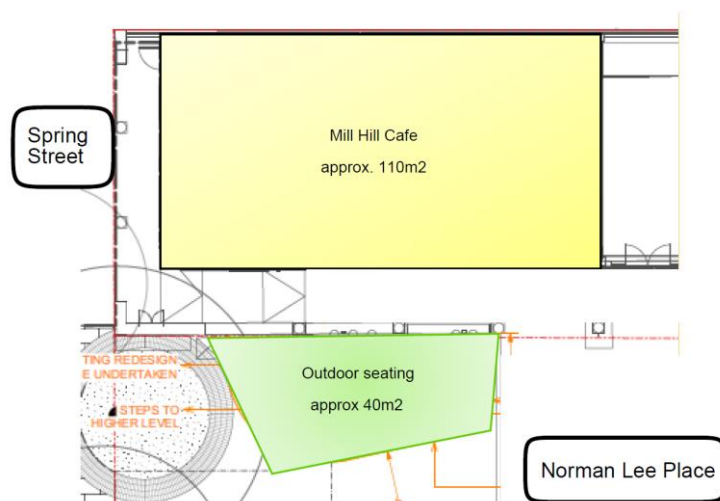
Plan of Mill Hill Café and outdoor seating area.
